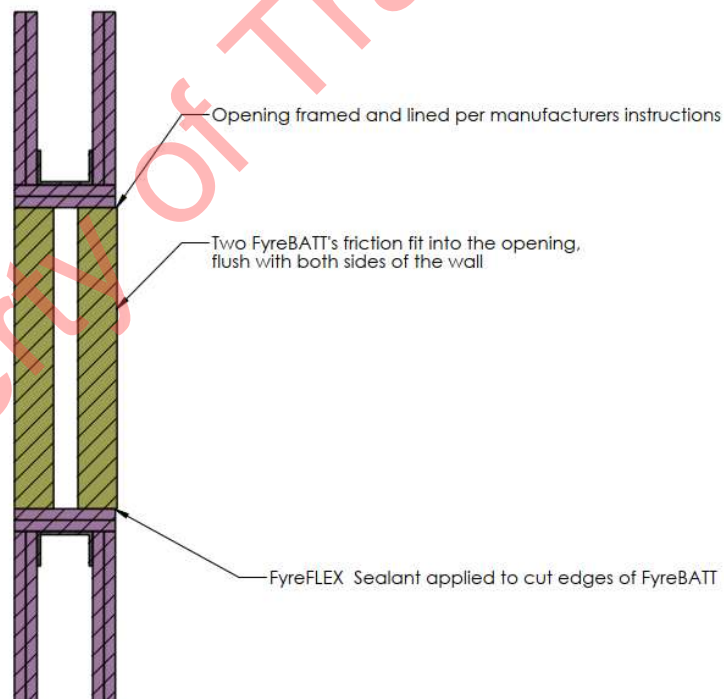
Blank seal protected with two layers of FyreBATT in plasterboard wall system – installed with a cavity
